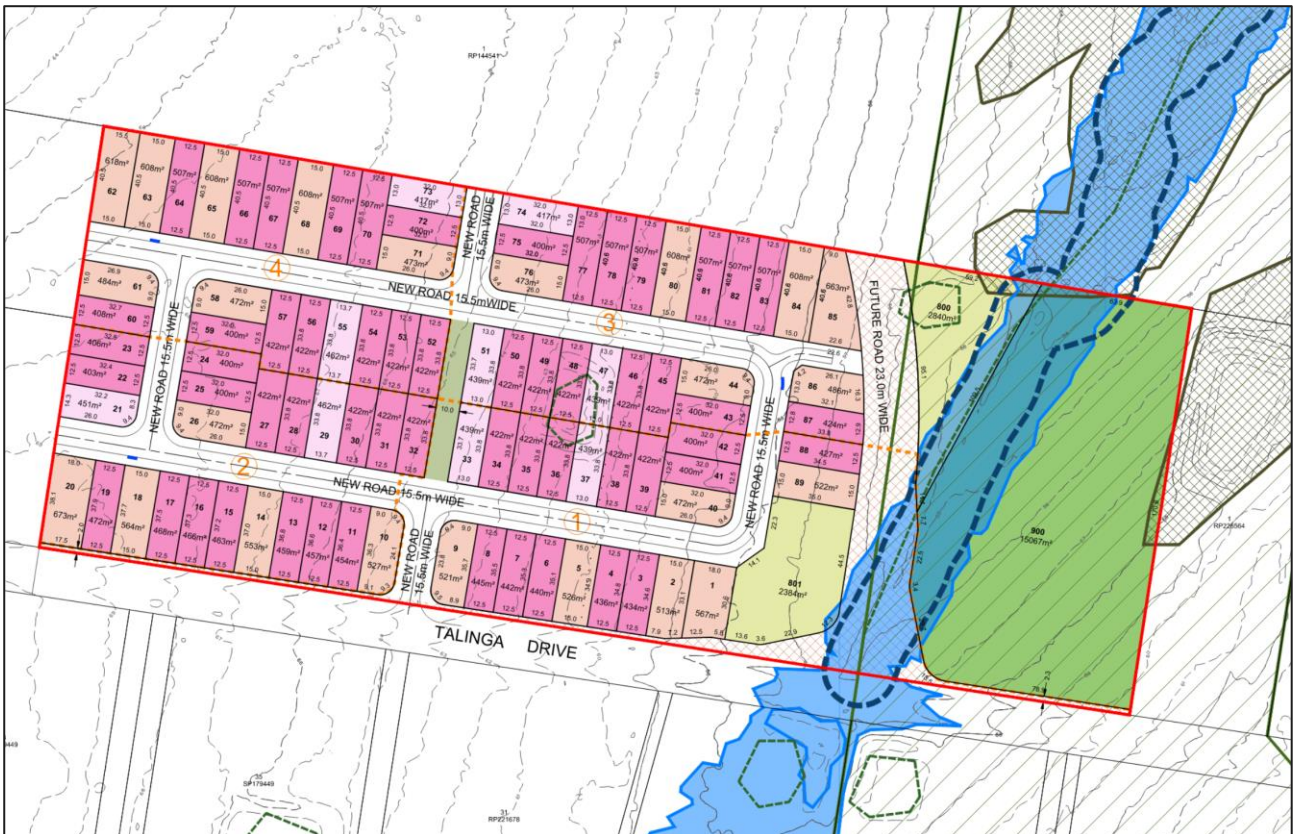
Proposed Development Layout (Courtesy of Saunders Havill Group)
